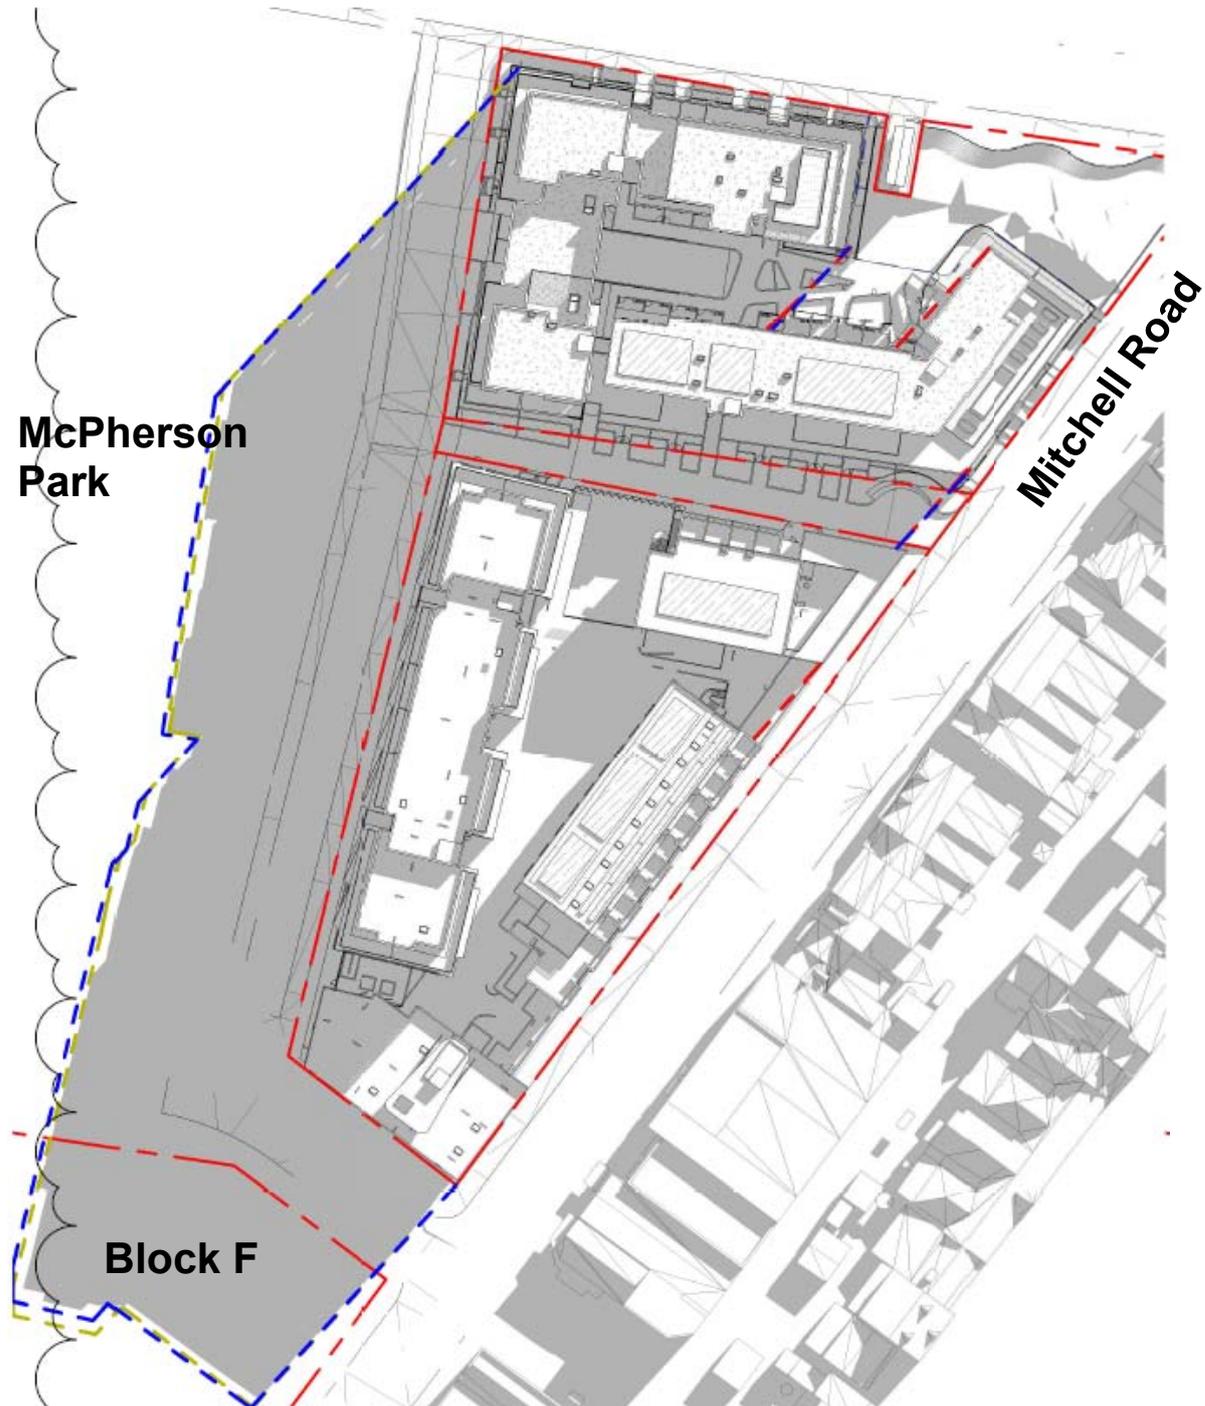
9am mid-winter shadow analysis. The blue line is the existing Concept Approval shadow, the yellow line is the proposed amended building envelope shadow, and the actual shadows are those cast by the detailed design DA as currently proposed.
